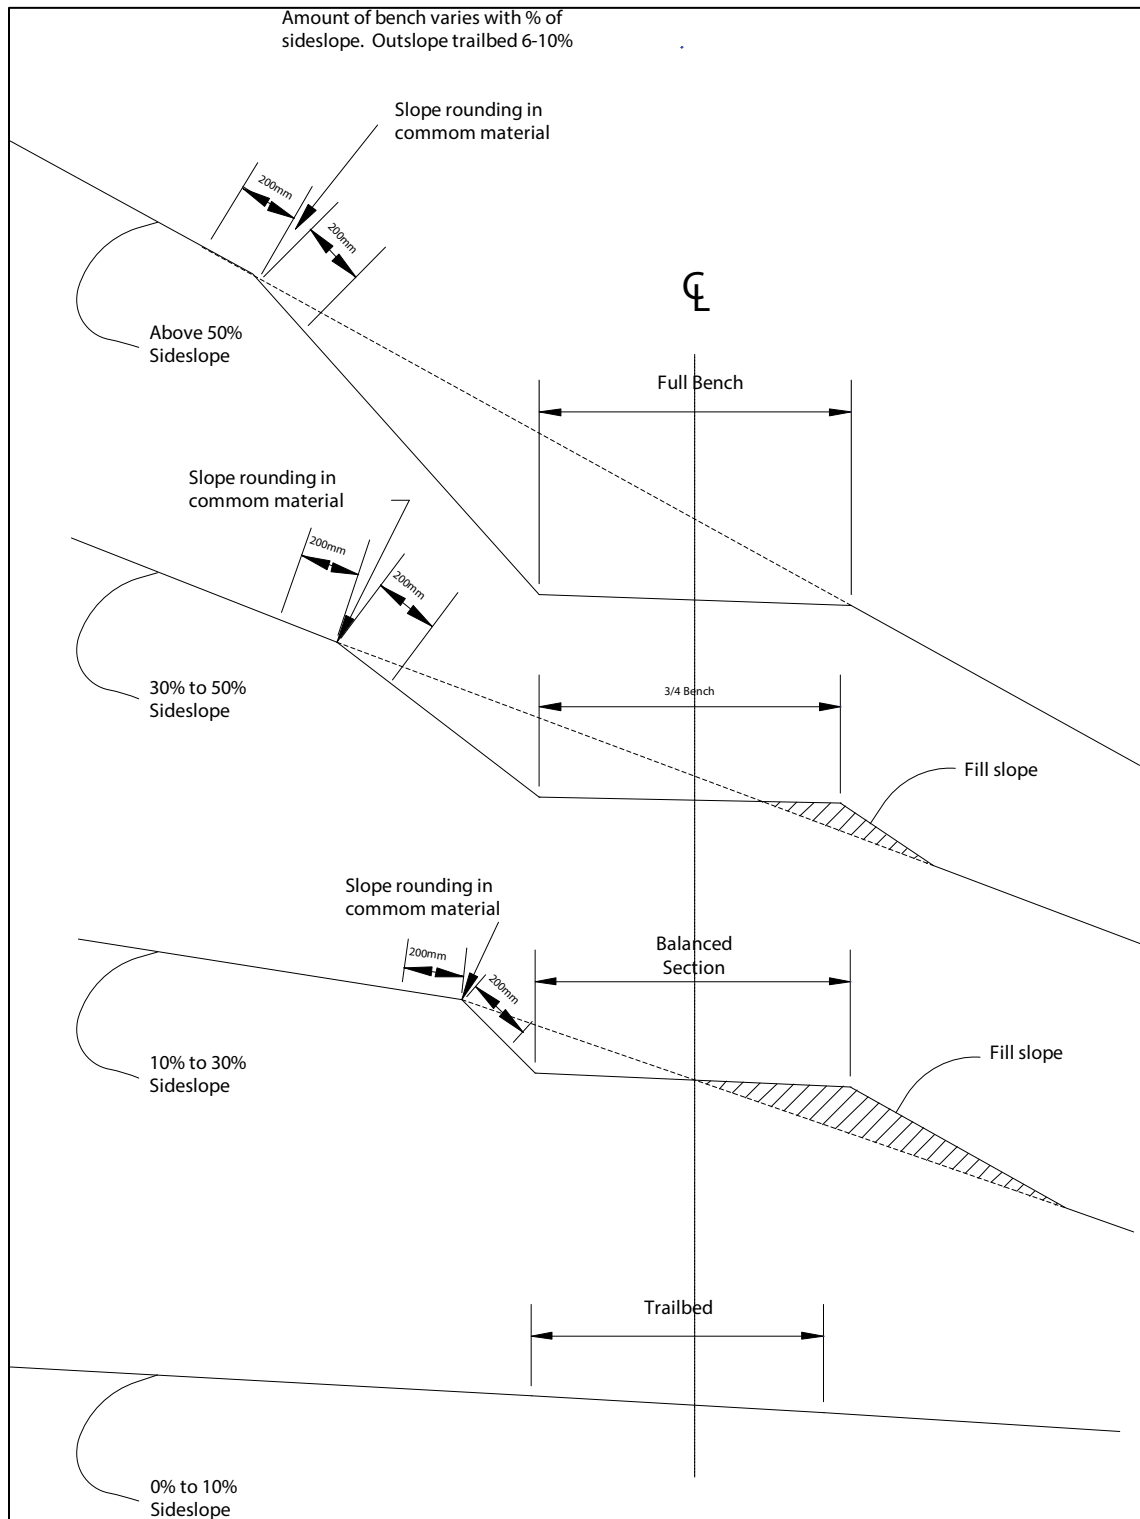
Typical Trail Construction Design on Varying Slope Angles
